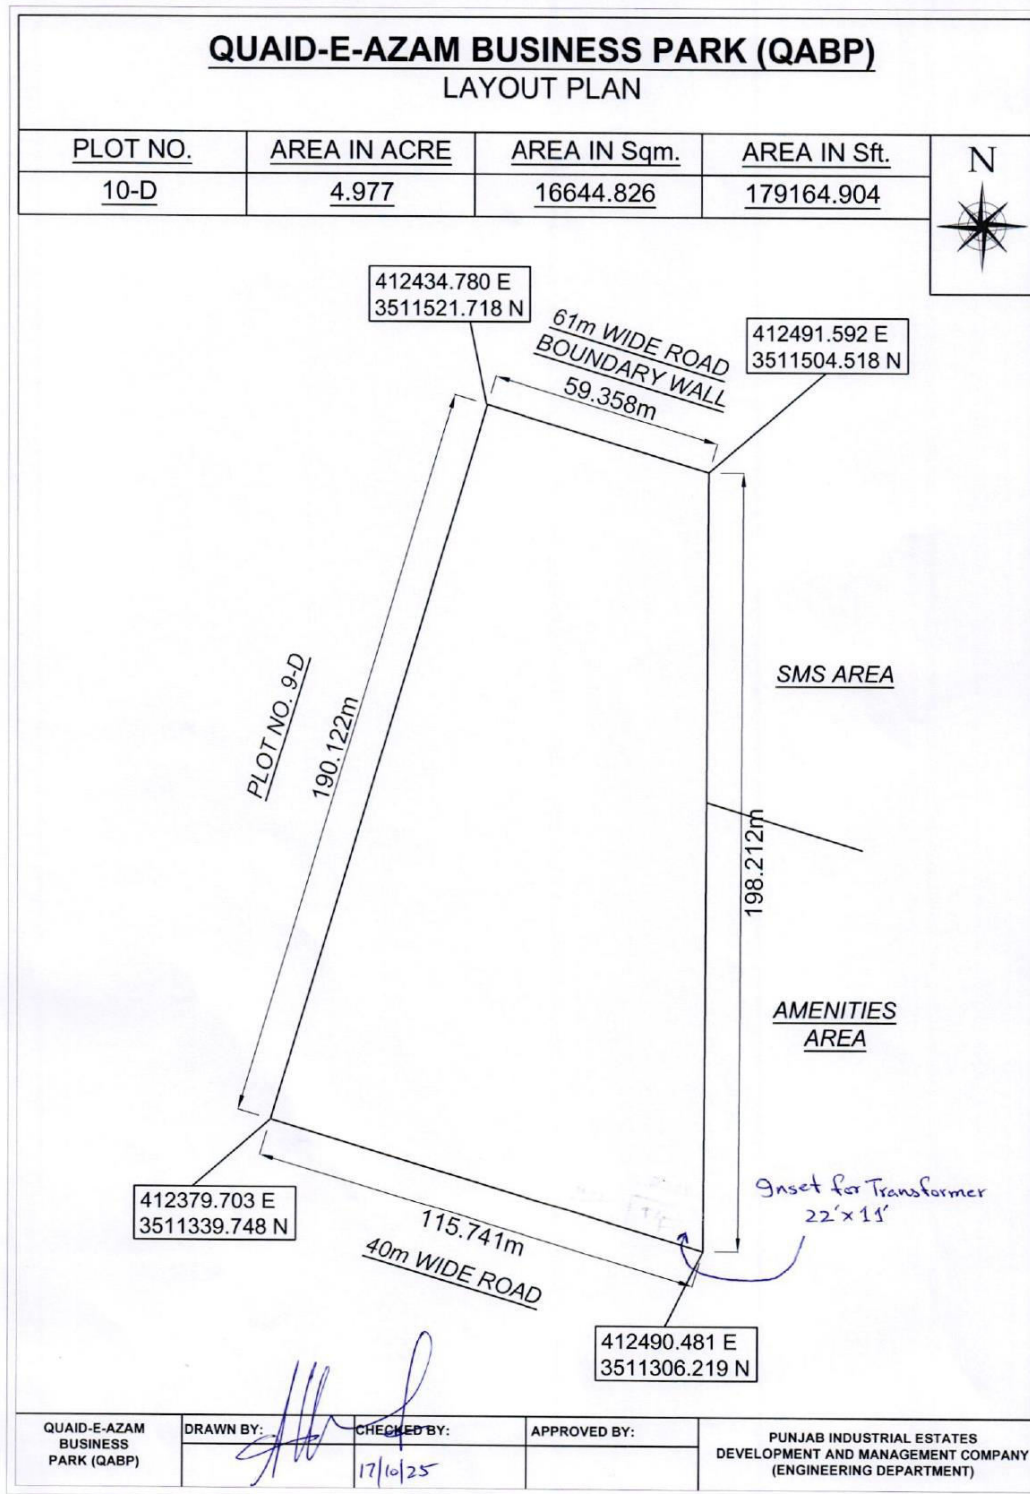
QABP Approved Layout Plan of the Proposed Project
